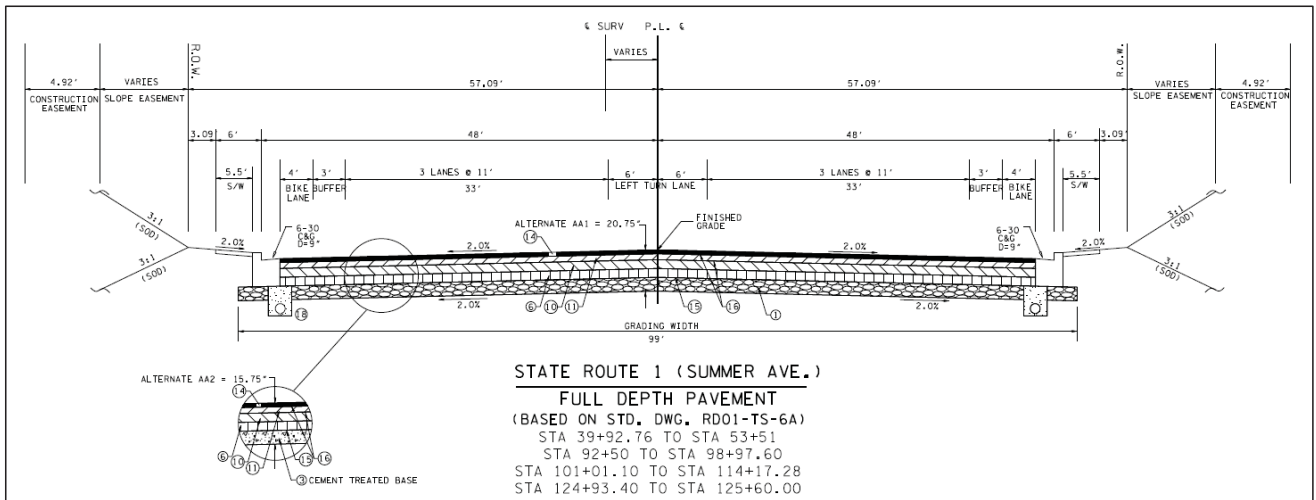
Current SR-1/Summer Avenue Typical Section at Dual Left Turn Lane Locations
